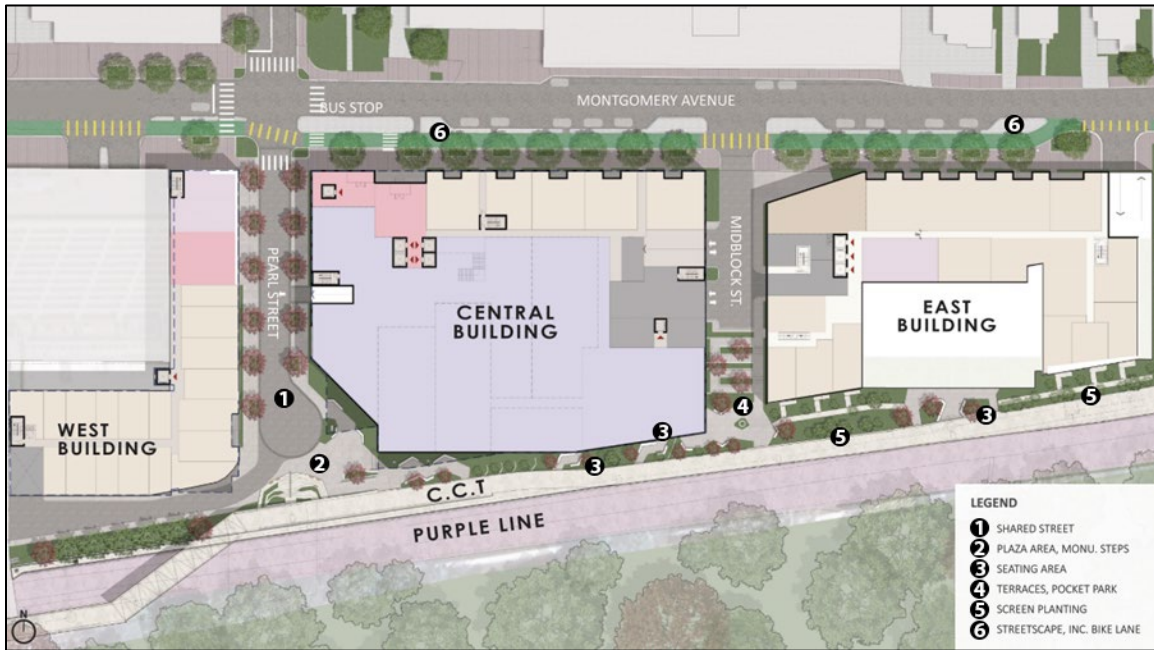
Concept rendering of Sketch Plan No. 320260020
